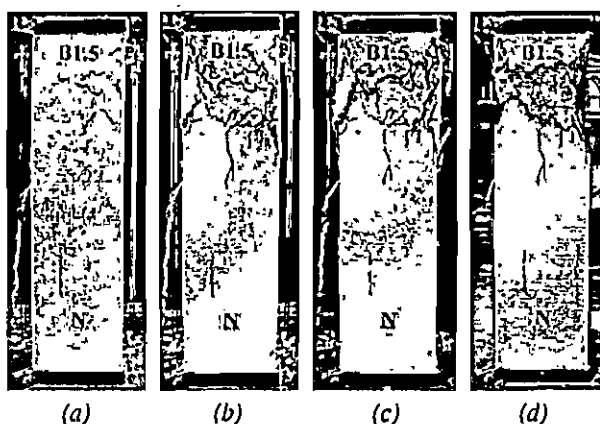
Gradual cover spalling in Specimen B1.5: (a) cracking just prior to peak load; (b) controlled crushing; (c) gradual spalling of cover; and (d) specimen at end of testing.
